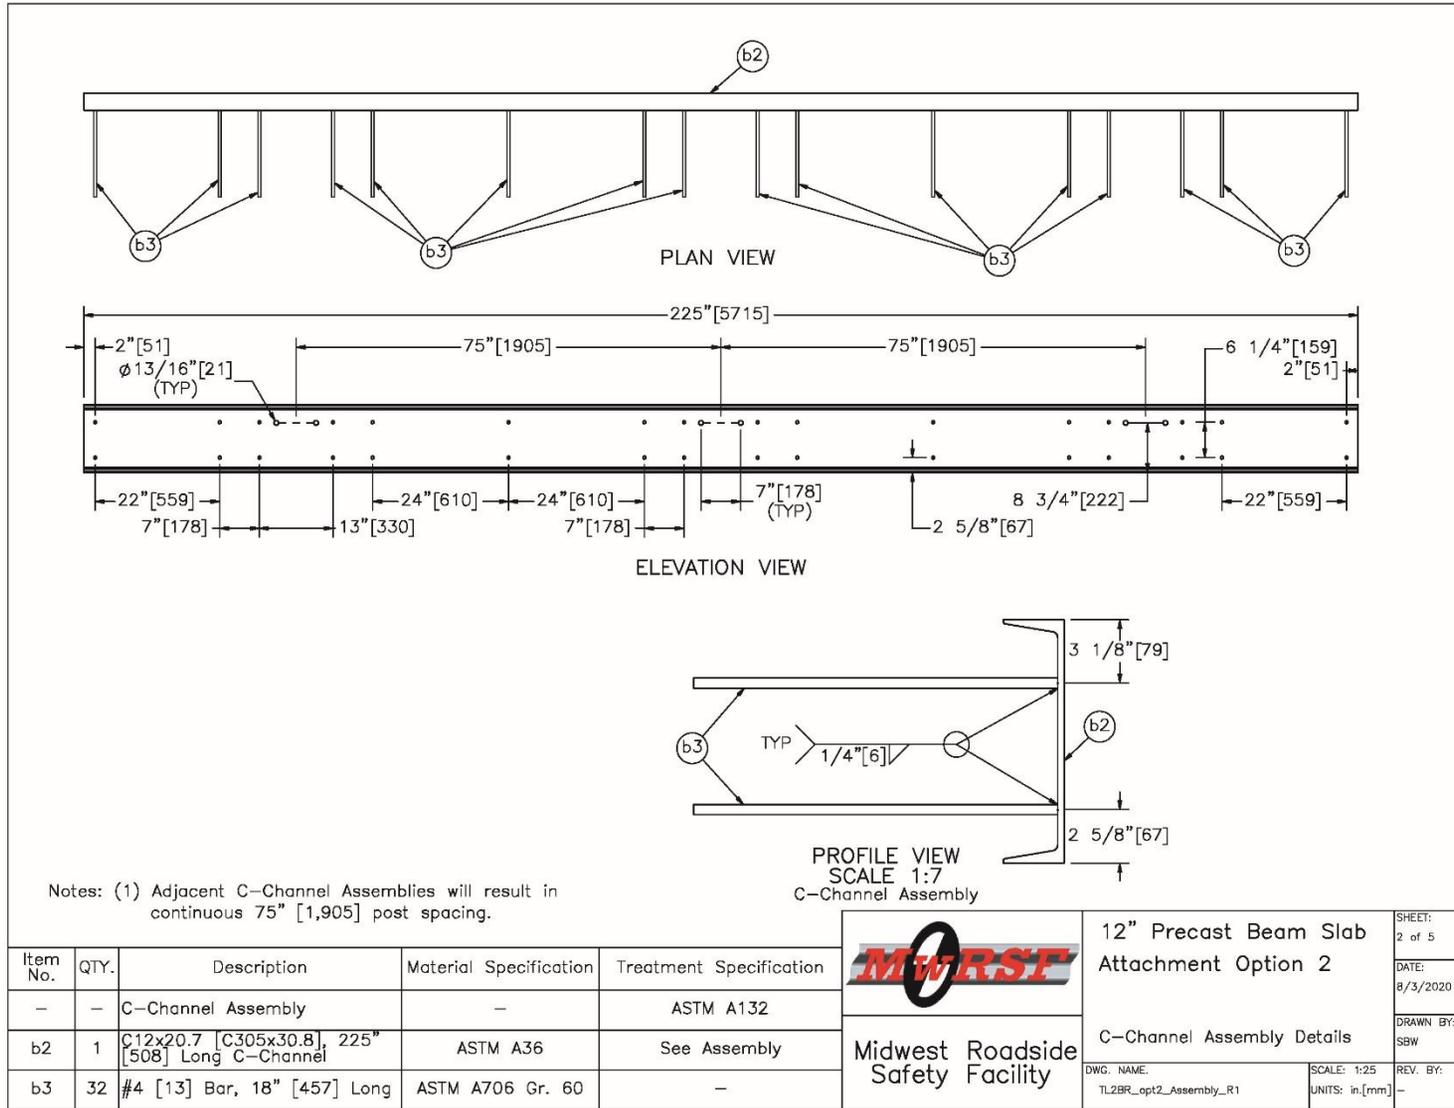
System Details, TL-2 Bridge Rail Attachment to 12-in. Deck, Option 2, Channel Assembly
